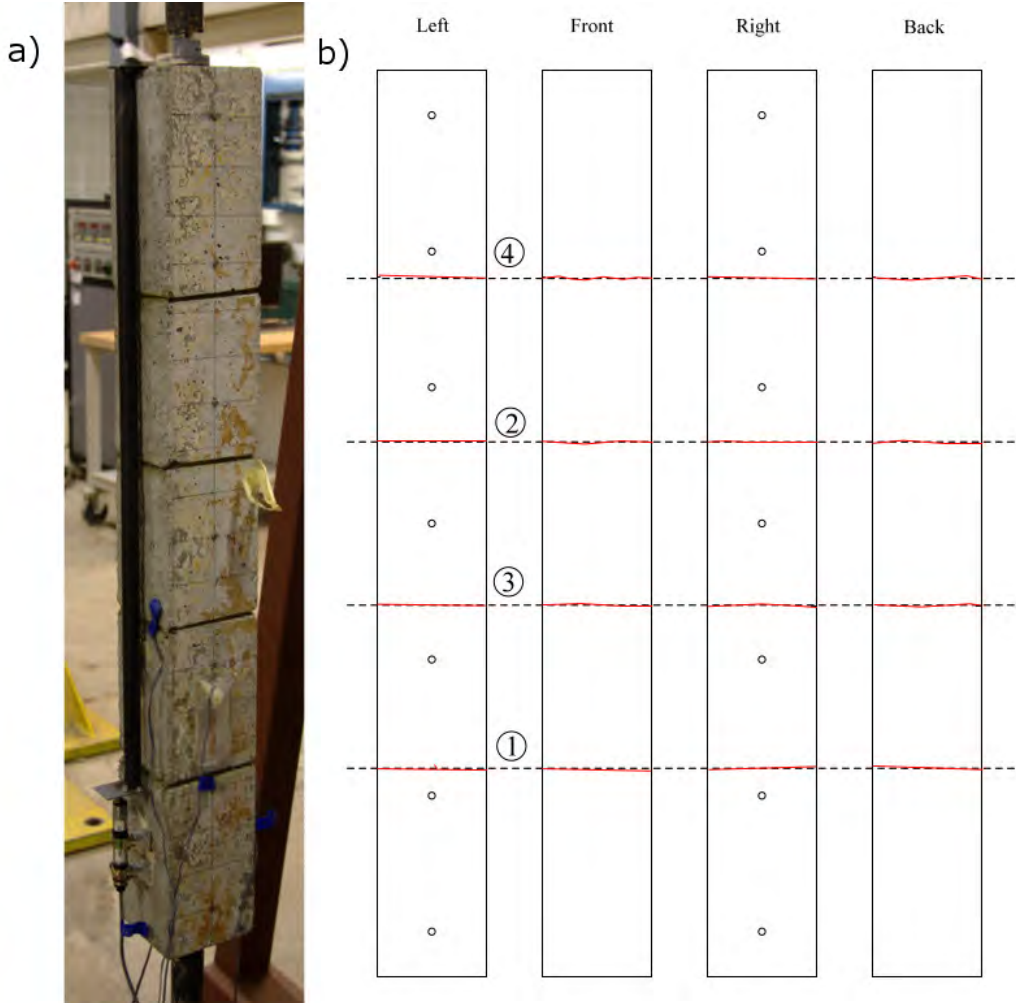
C2F16n: a) specimen during testing b) crack pattern.
